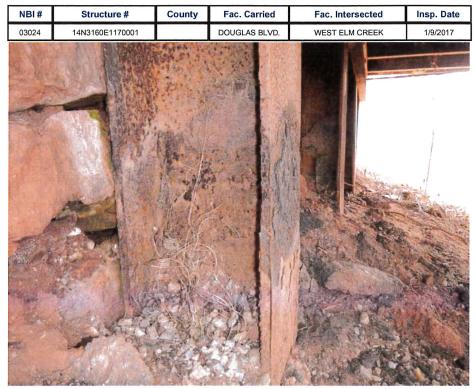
Looking southeast at west truss, lower chord. Note: L0L2 has been replaced with batten plates welded to lower chord in this section.
